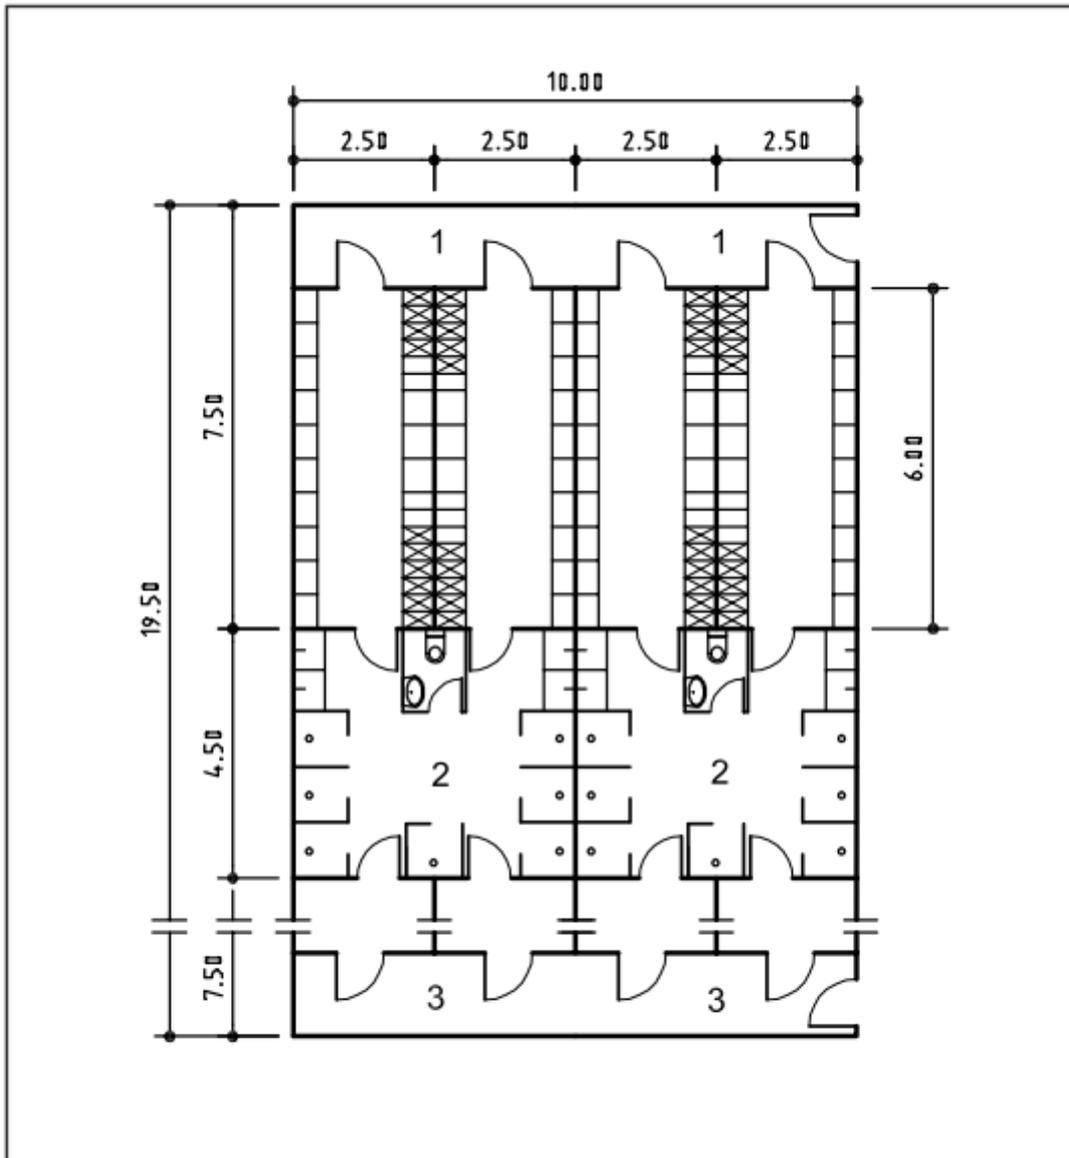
Planning example 4 for changing and sanitary areas with 2 x 36 changing positions
